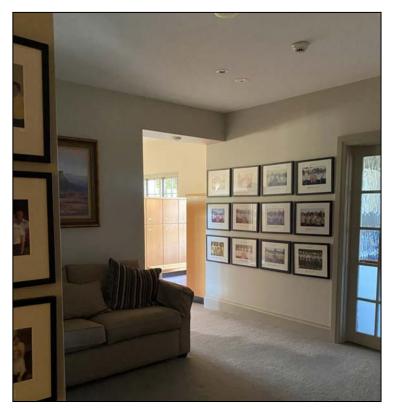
Existing office space where the Pro-Shop will be relocated to.
